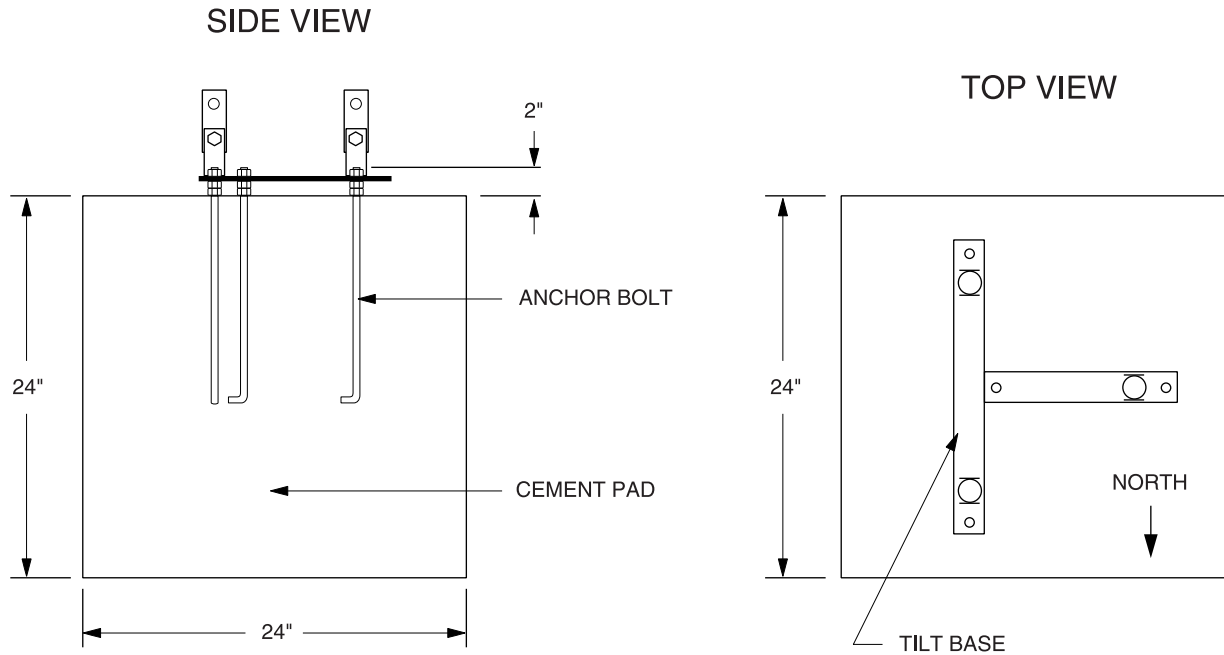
Concrete Foundation and Anchor Bolts
